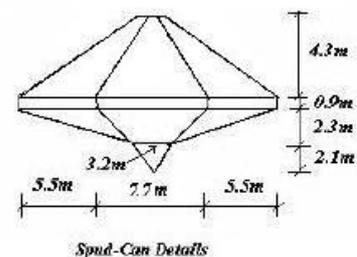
A shows a typical configuration of spud-can used for FE modeling of Neka Jack-up footing [26]:
